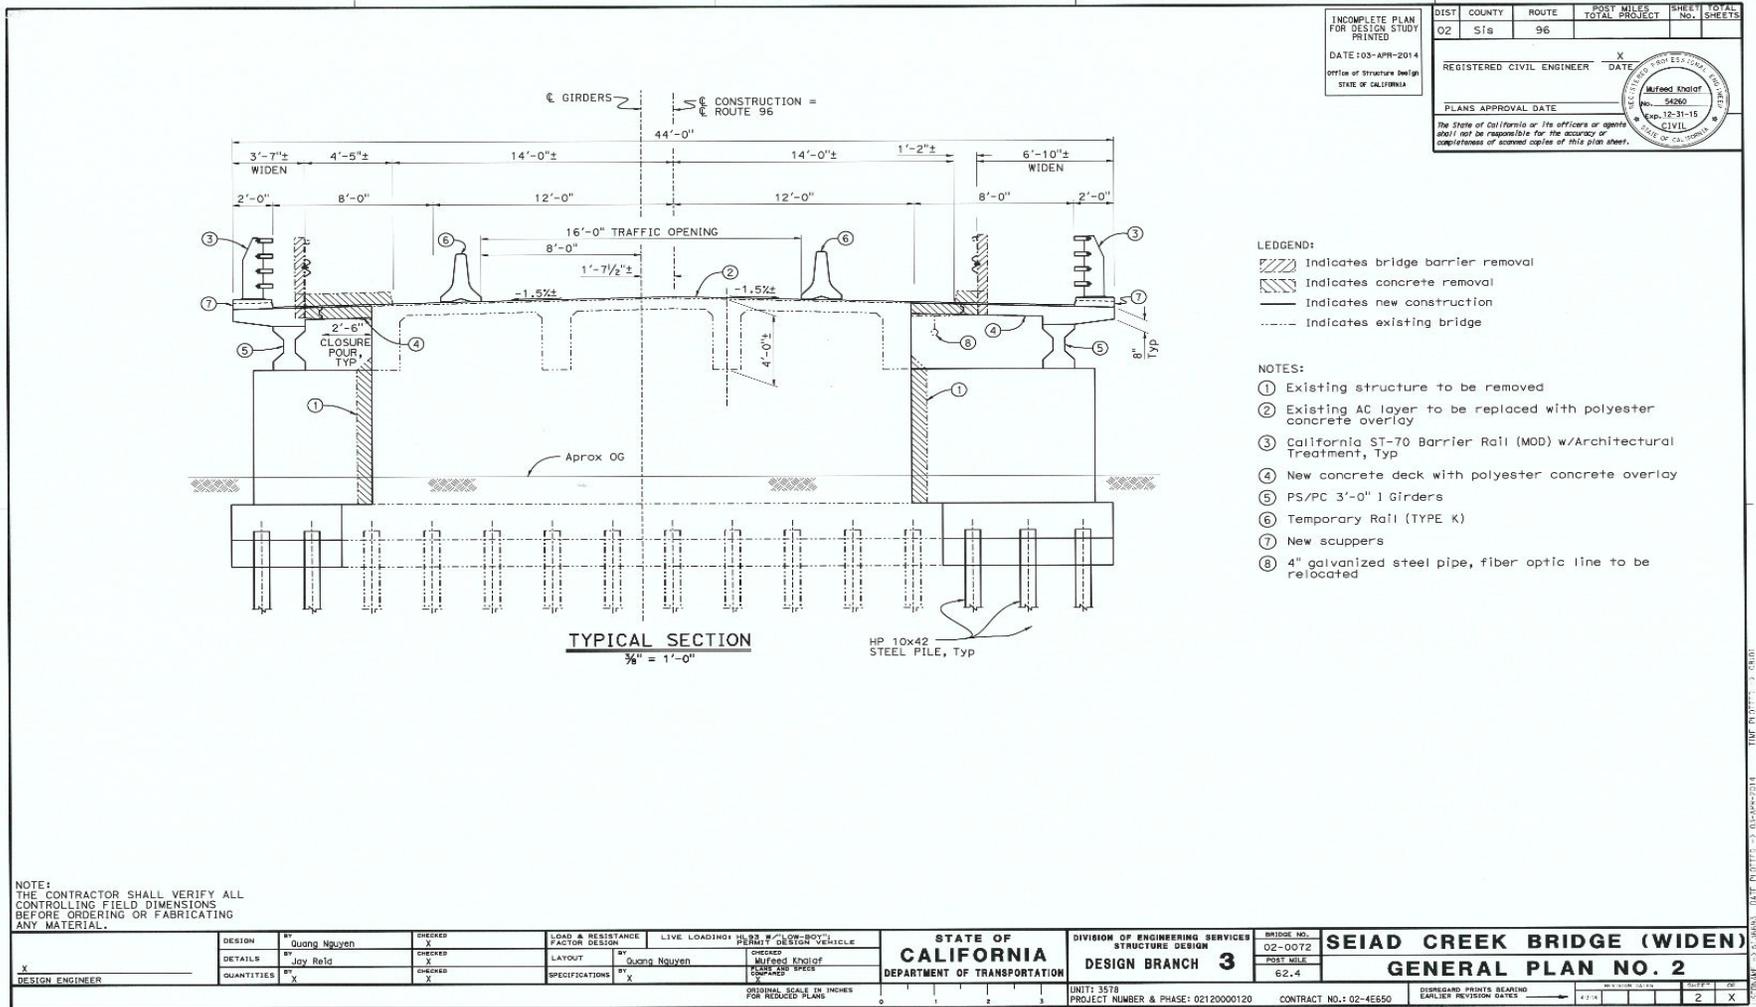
Bridge General Plan. Seiad Creek. Page 2 of 2.
